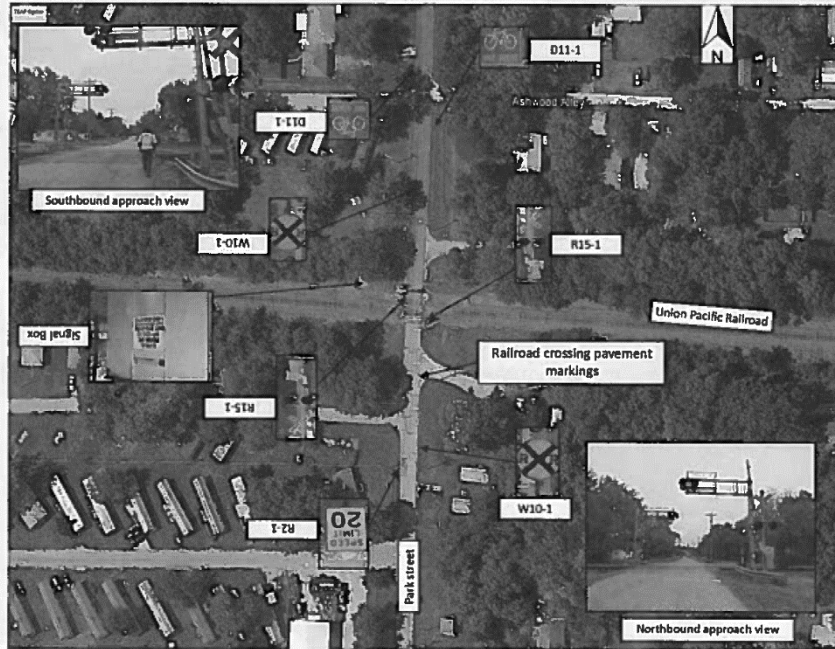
Existing signs and pavement markings at UP Railroad & Park location
